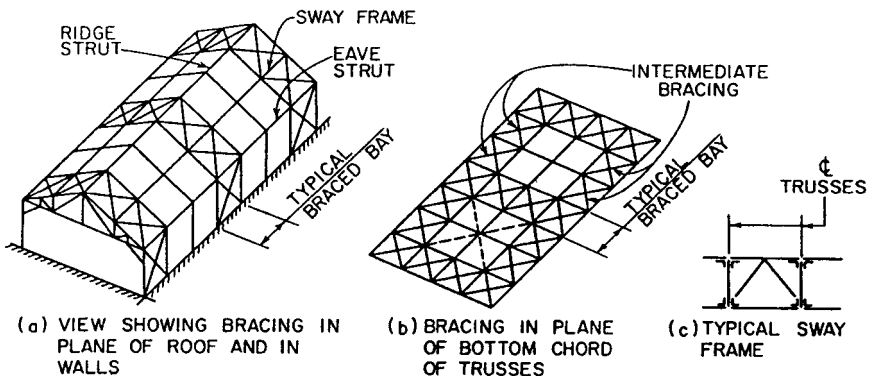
Braced bays in a one-story building transmit wind loads to the ground.
